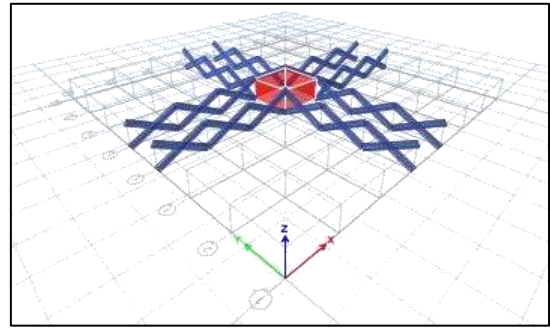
Perspective view of a storey of Building Model 2 (With X Outriggers)
